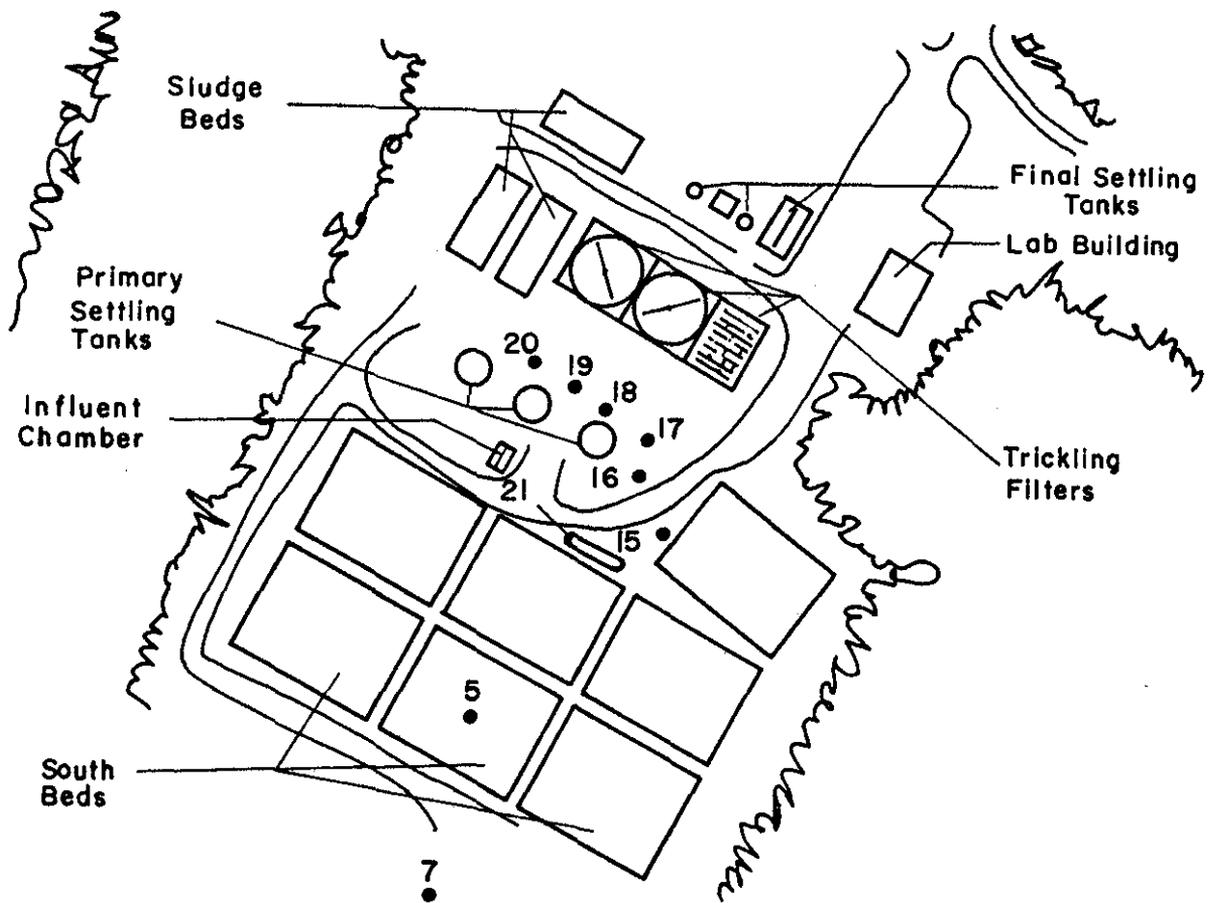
Plan Showing Location of New Wells Installed Specifically for the Tracer Studies.
